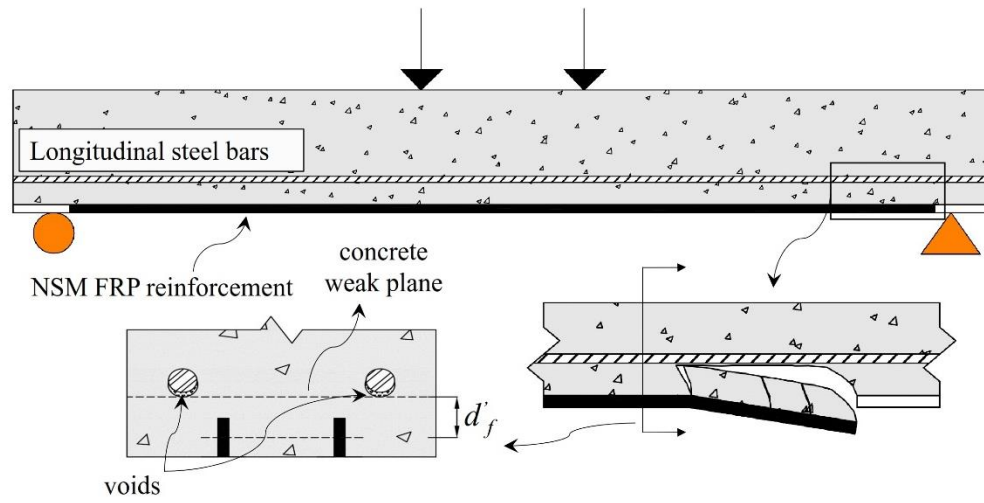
Concrete cover separation of RC beams strengthened with NSM FRP reinforcement
